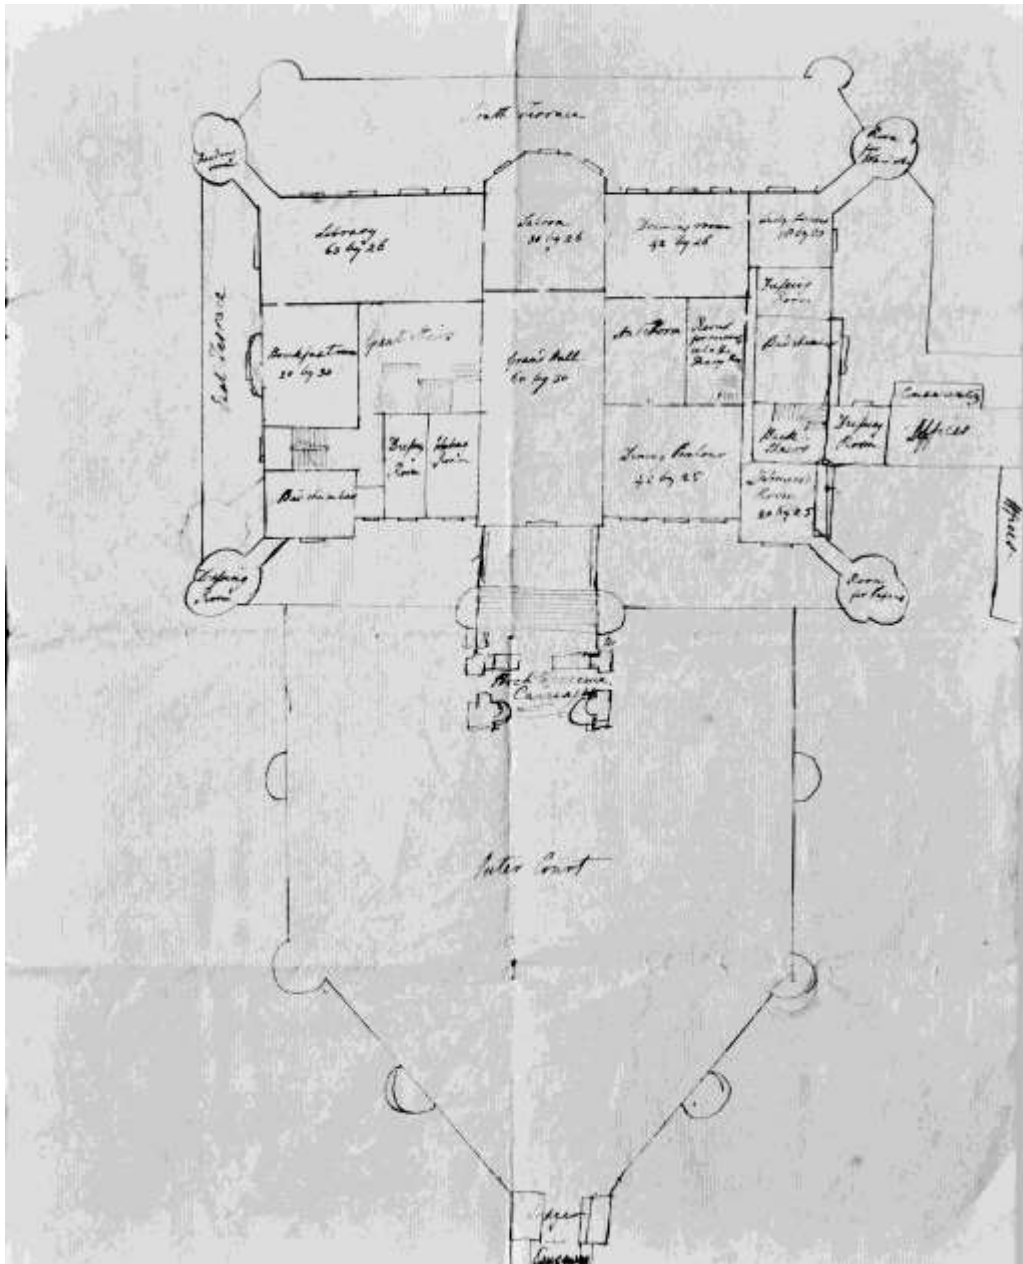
A sketch plan made by Earl Somers of Smirke's ground plan. Looking east with the Great Hall in the centre and the principal reception rooms on the east front - from the right - the Library, the Octagon Room and the Drawing Room (Eastnor Castle)
